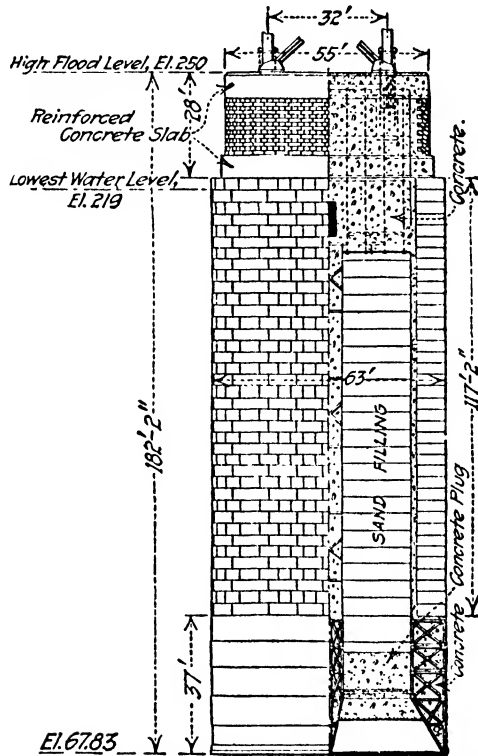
Metal Open Caisson with Dredging Wells for Harding Bridge.
